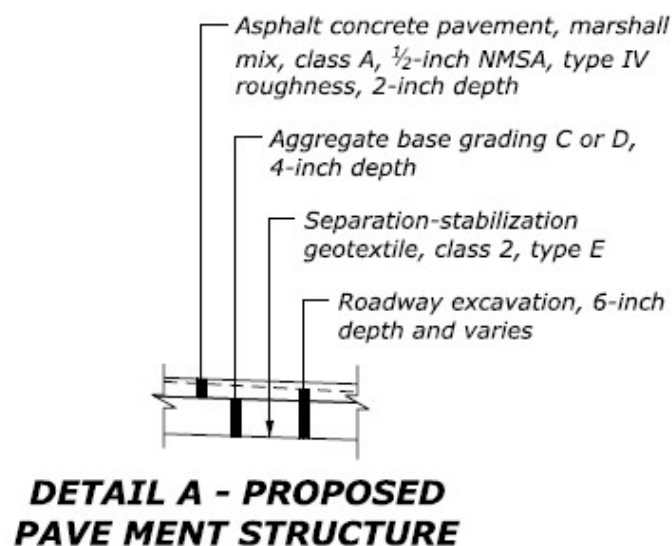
Snippet of undertaking's plans showing the asphalt reconstruction details.
